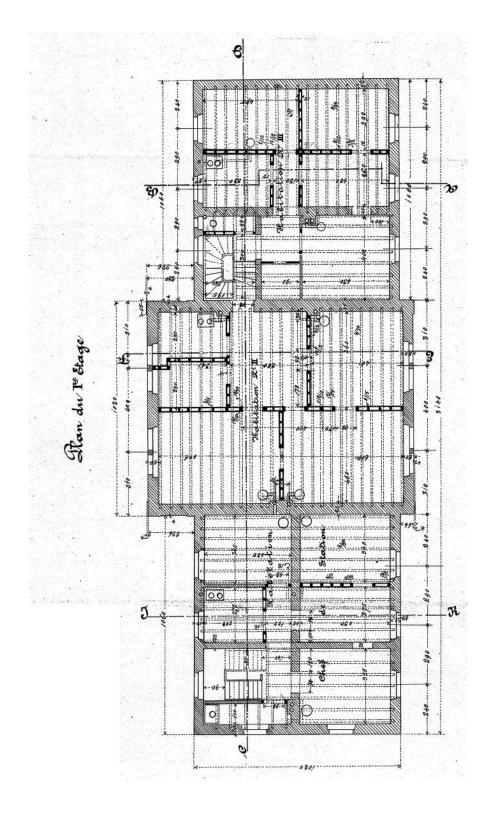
Ist class station building project drawn for Konya / First floor plan
